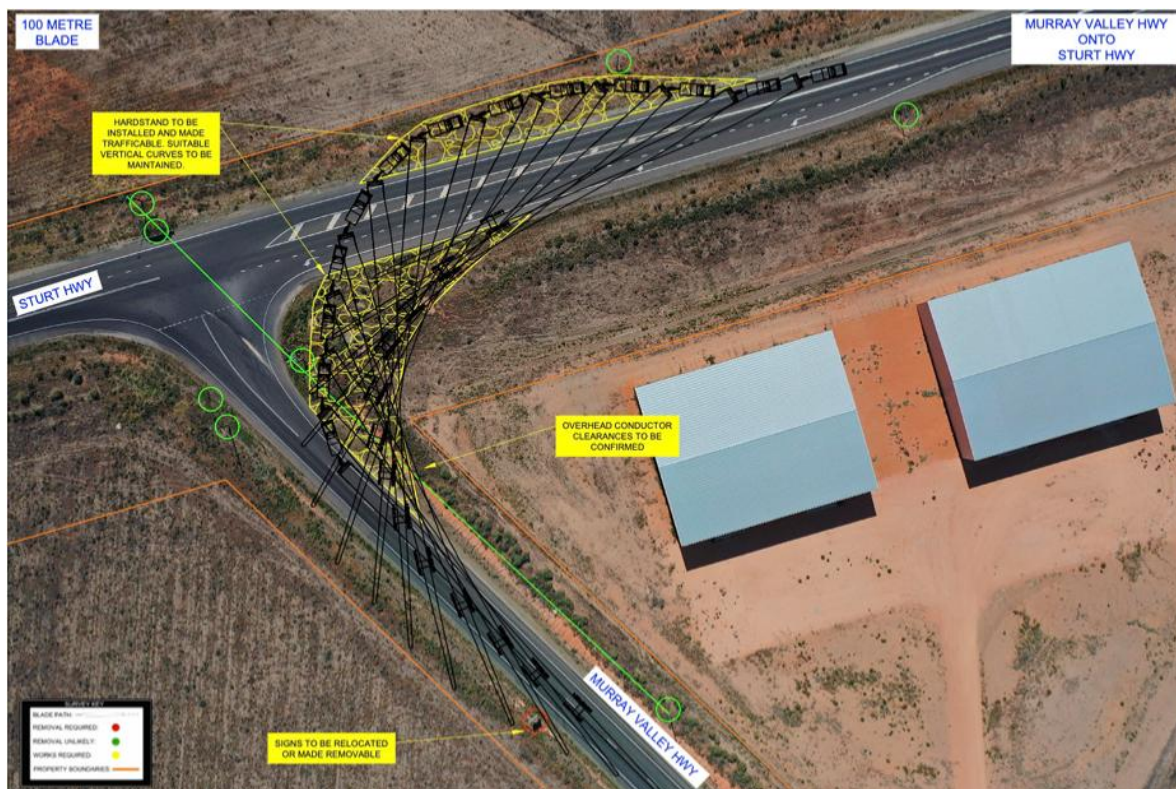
Proposed design for works at the intersection of the Murray Valley Highway and Sturt Highway, Euston (Rex J Andrews 2024).
